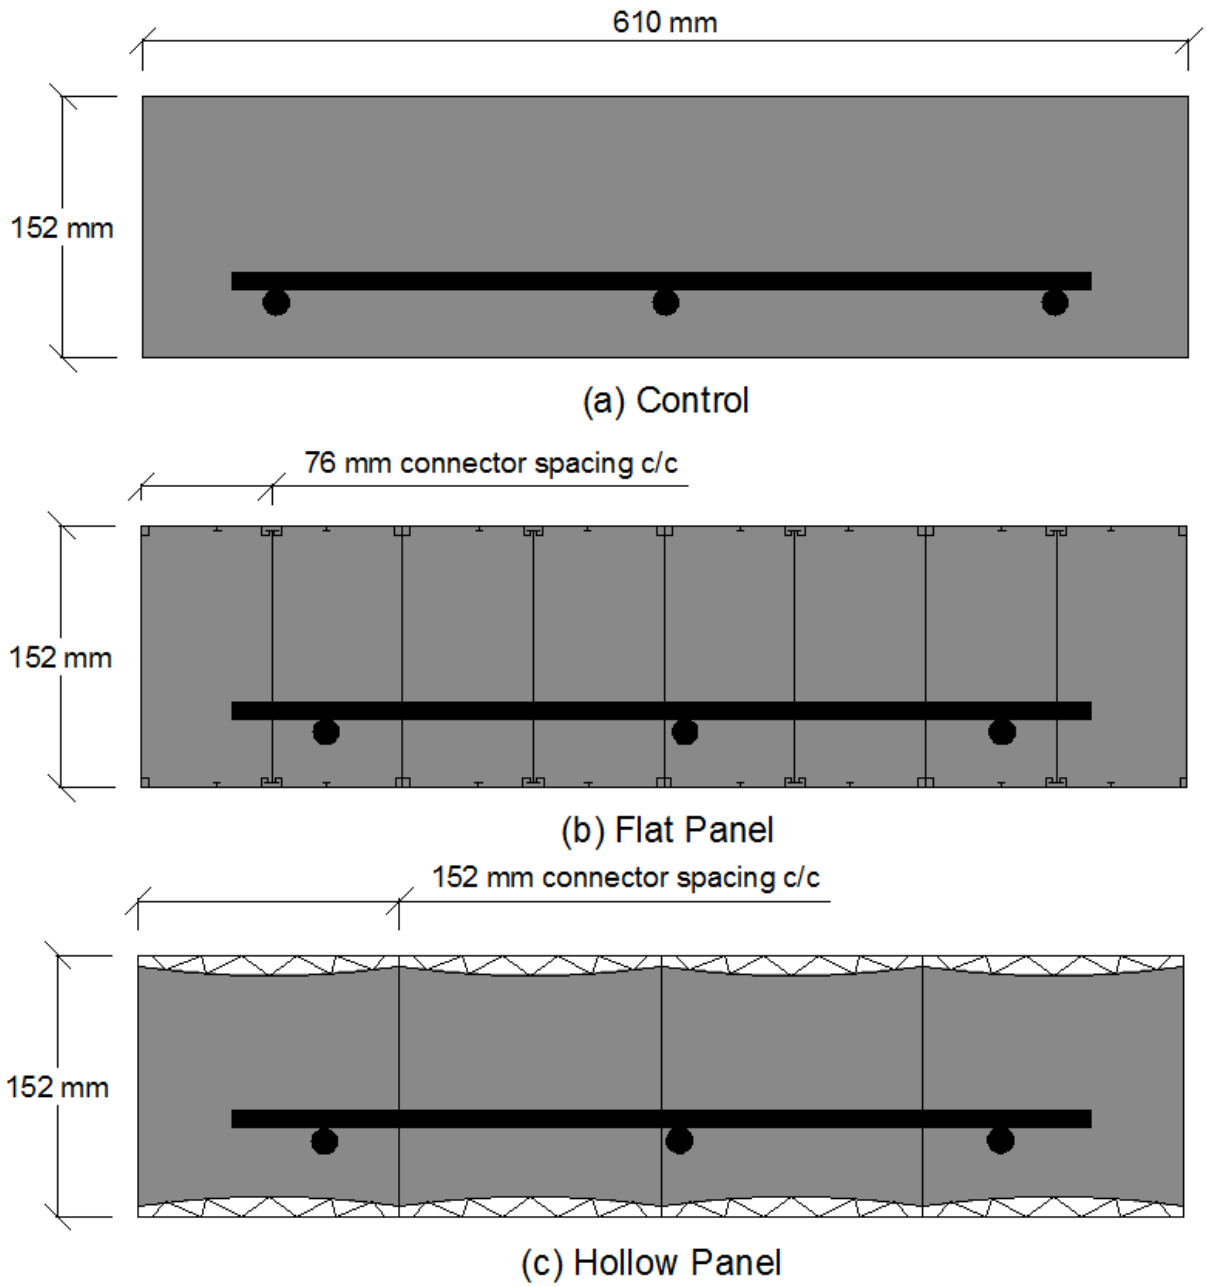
Cross-sections and dimensions for the (a) control, (b) flat panel encased, and (c) hollow panel encased wall specimens
